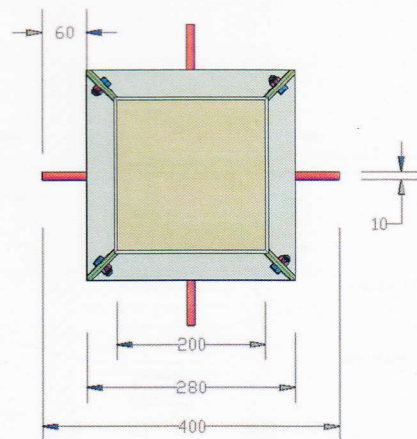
Typical Plan View of Test Specimen (Specimen S03 as an Illustration)
